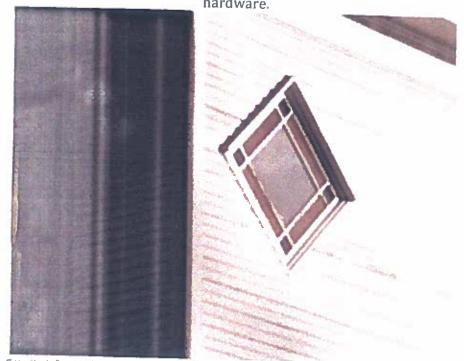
2nd floor diamond shape window to the northwest room. This floor is not designed to be opened.
